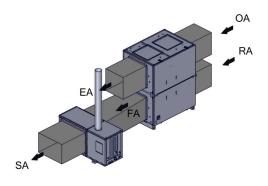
TYPICAL INSTALLATION OF INDOOR TOP EXHAUST FURNACE
